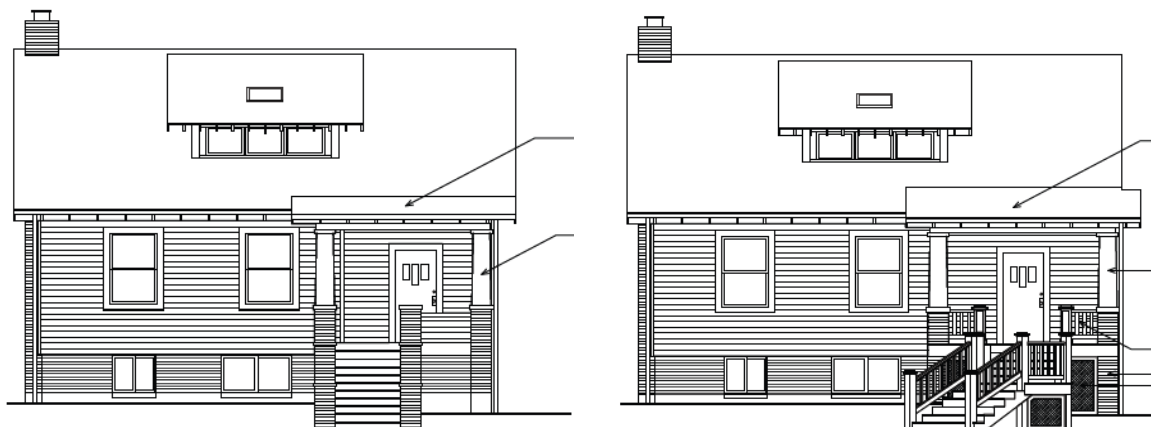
Existing (left) and proposed (right) front elevation showing the existing and proposed front stairs.
